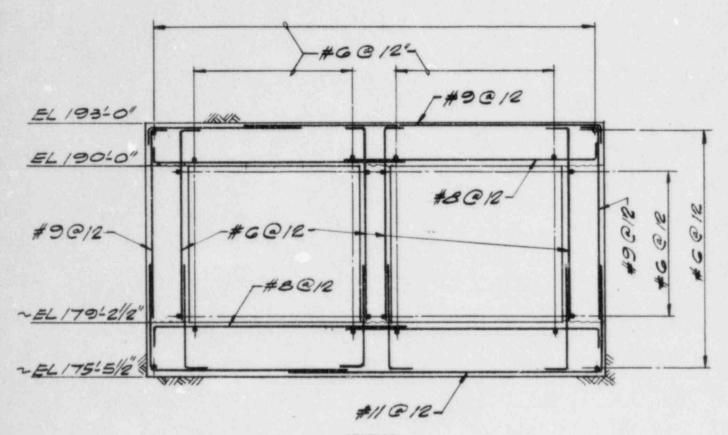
DIESEL GENERATOR PIPING TUNNELS – TYPICAL REINFORCING DETAILS
